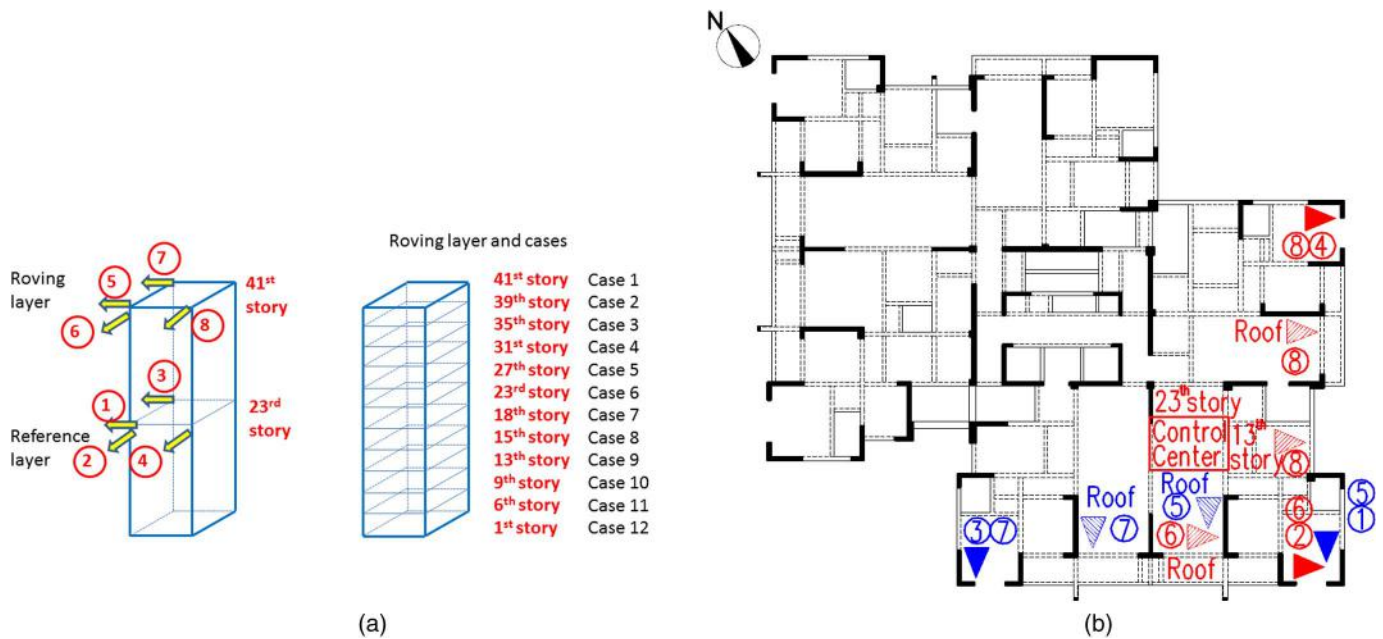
Instrumentation layout for Jin Sui Xiao Qu 3#: (a) case definition in an elevation drawing; (b) instrumentation layout in plan
